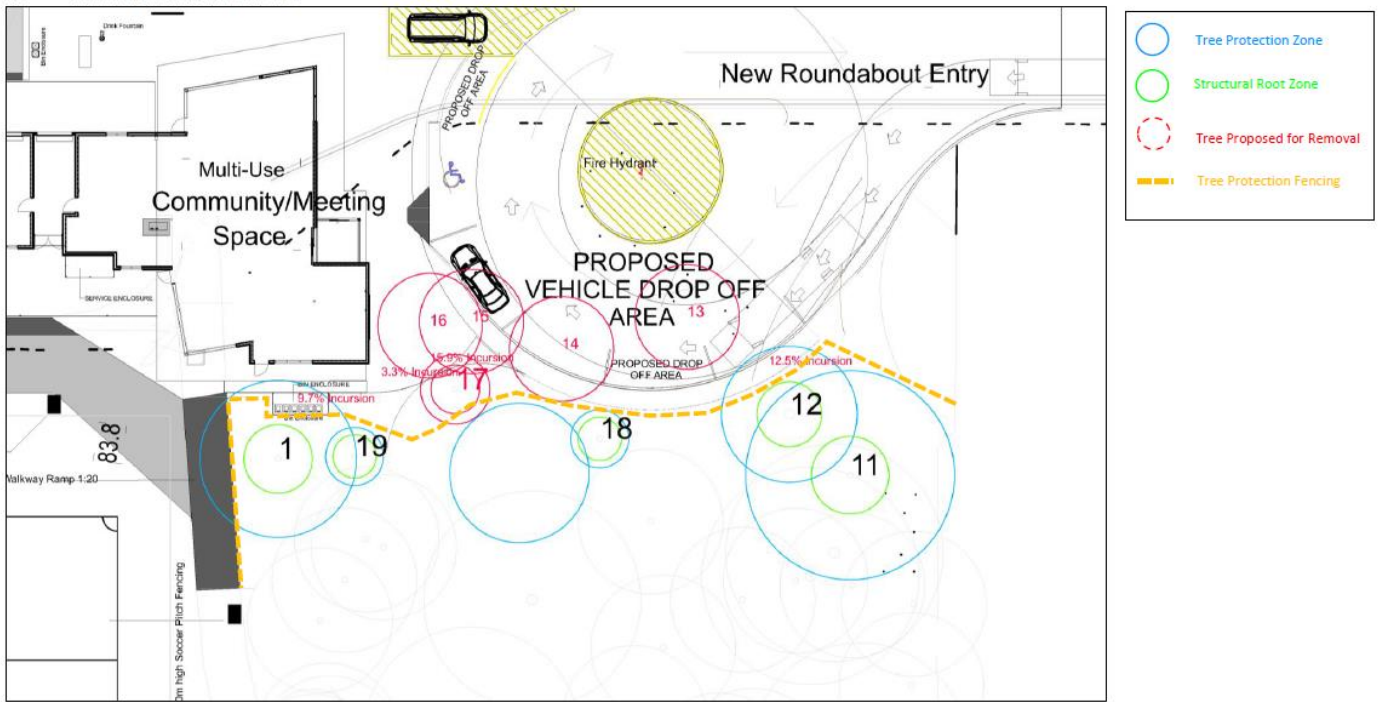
Site Plan (JCC Design) with tree protection zones drawn to scale (M. Sorenson)
